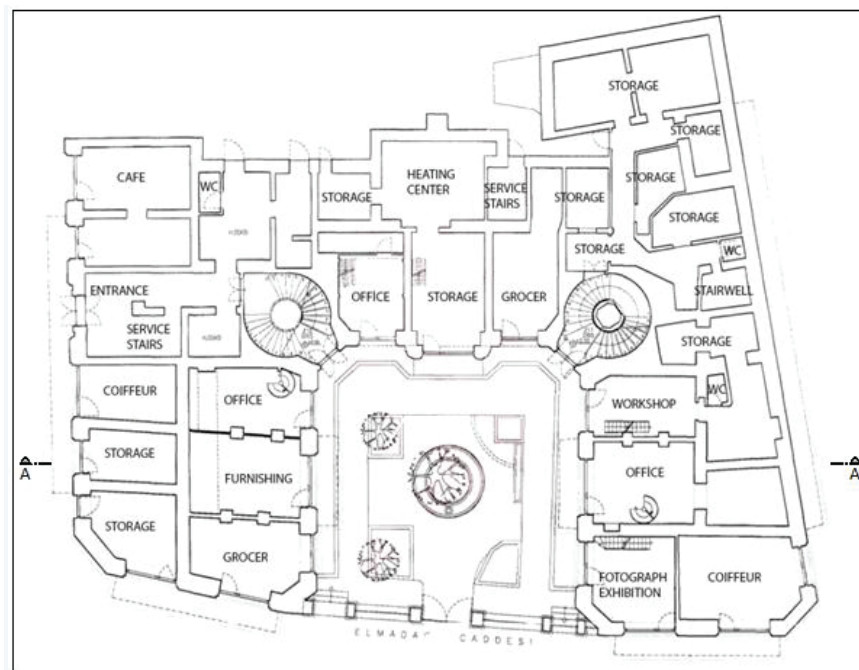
Ground floor plan of Arif Pasha Apartment ( Source: Öğrenci 1998)
